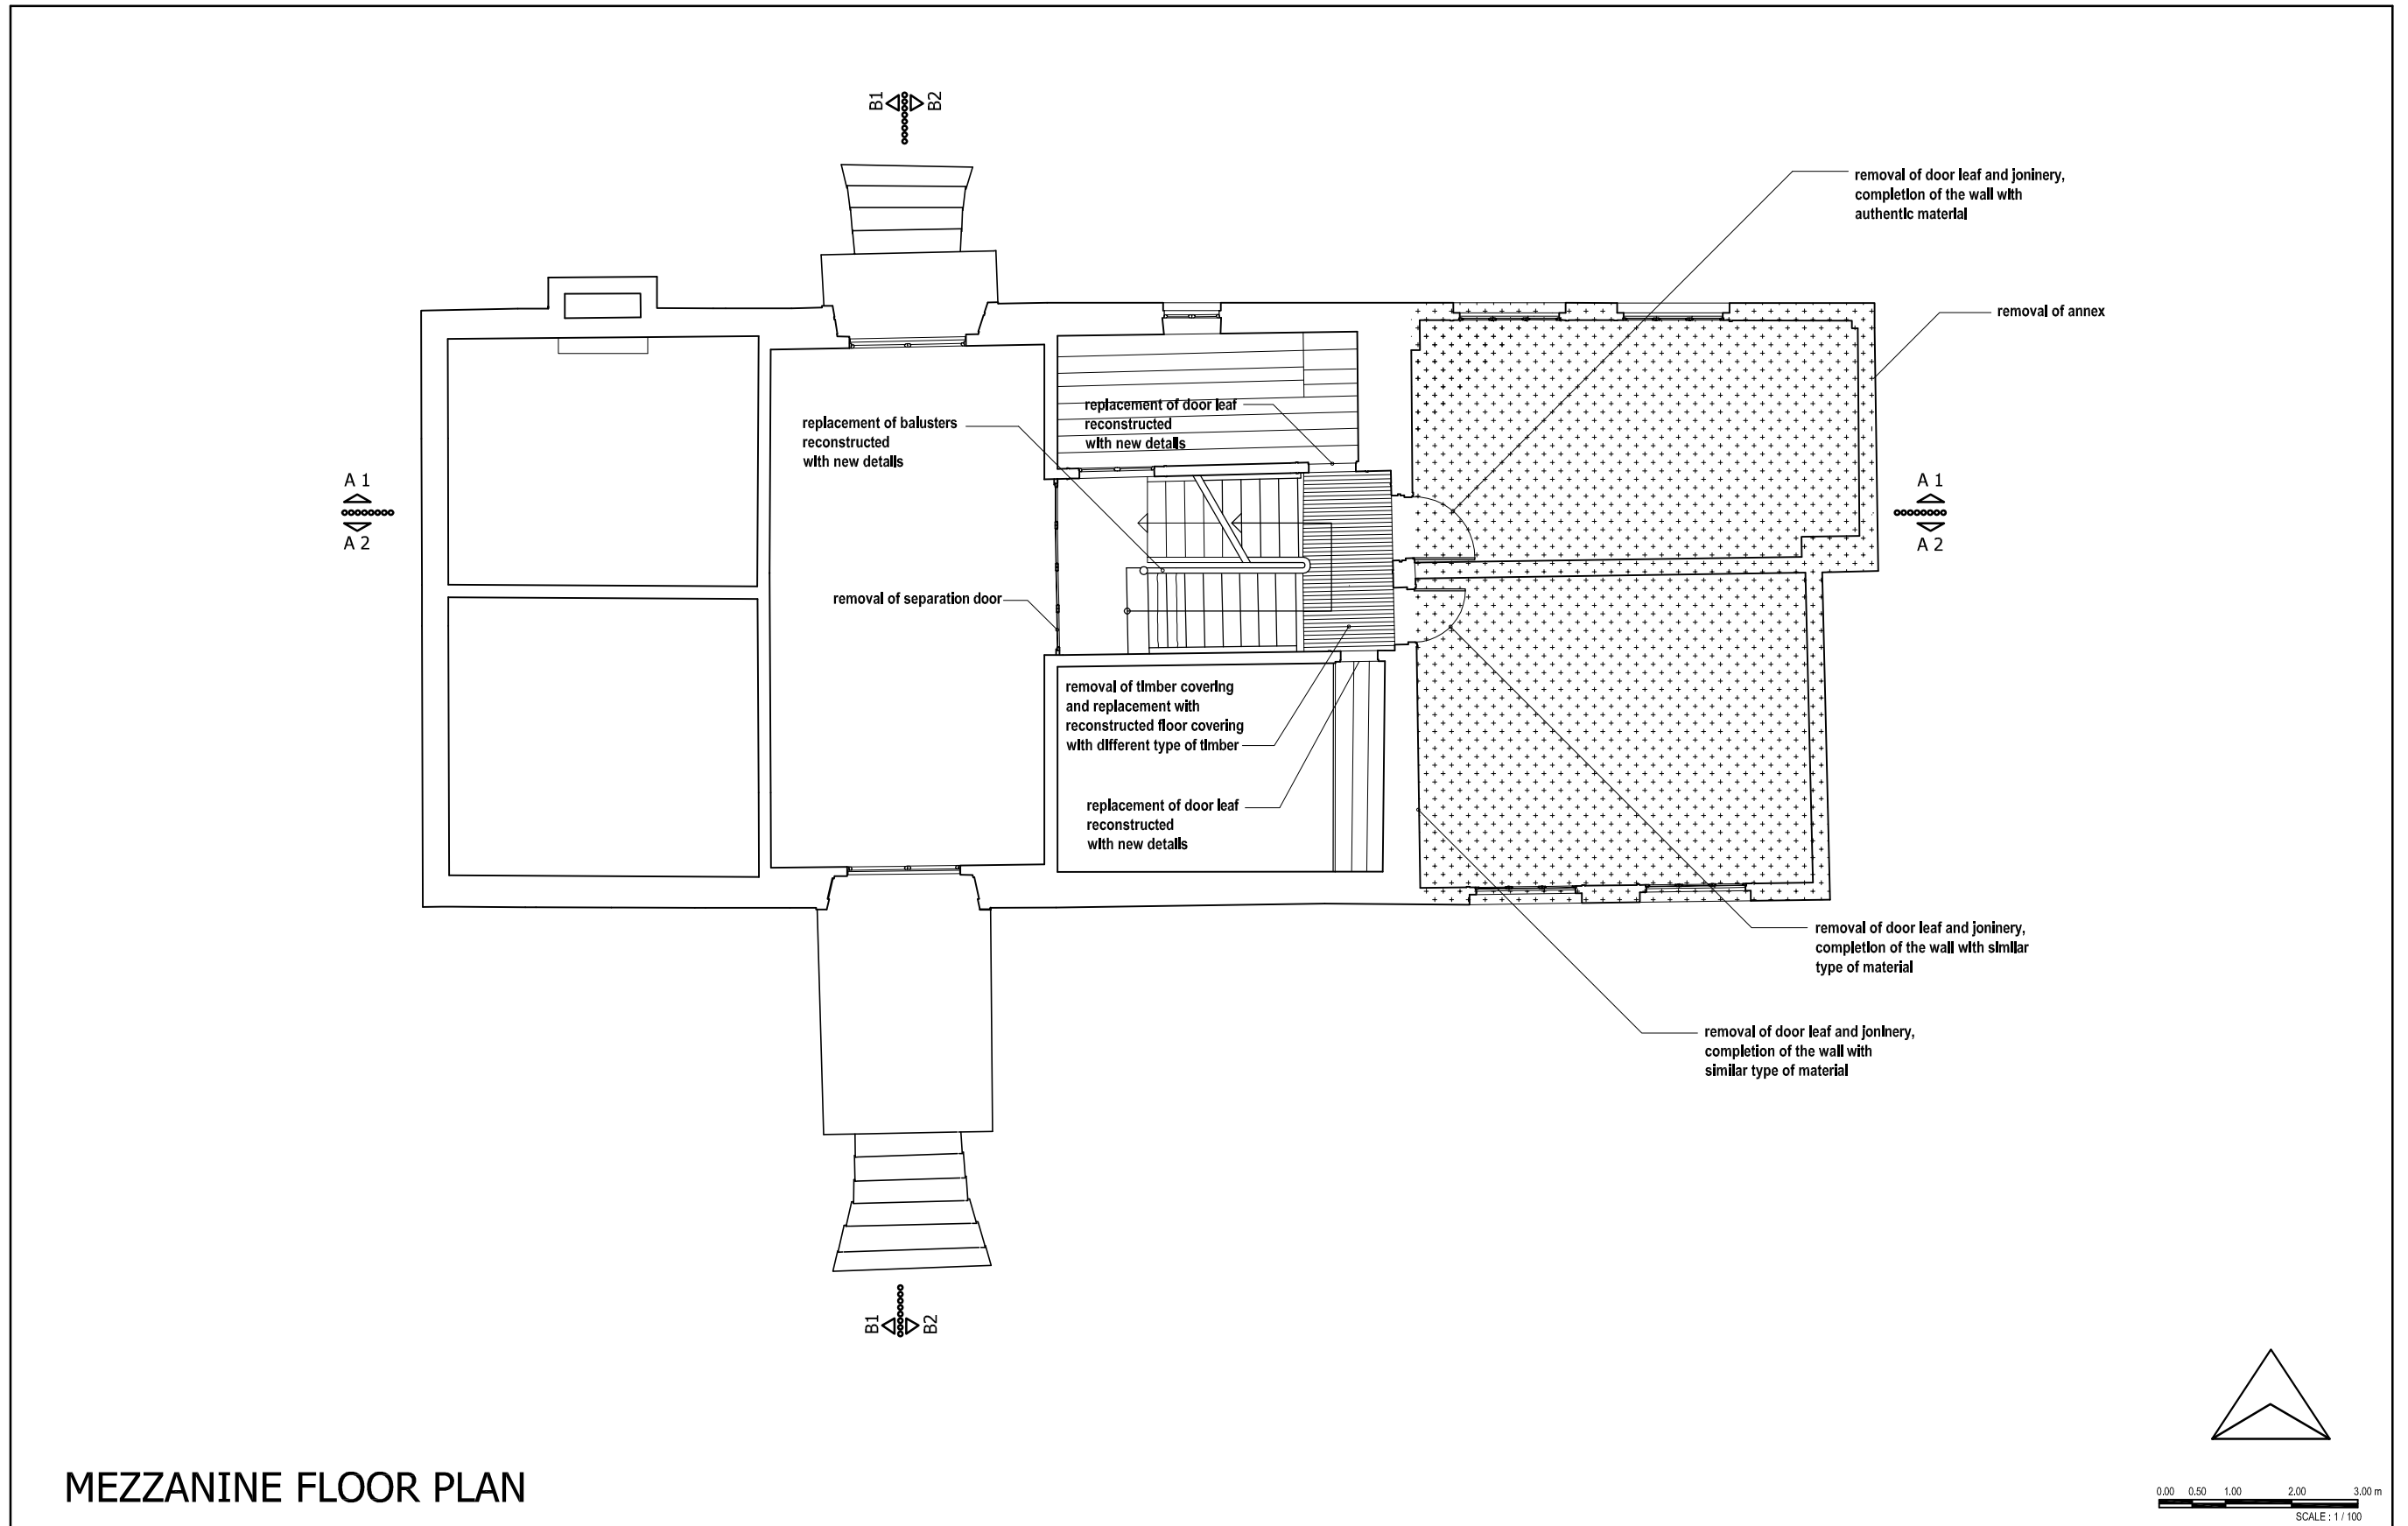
Measures for Ethics of Conservation- Mezzanine Floor Plan
